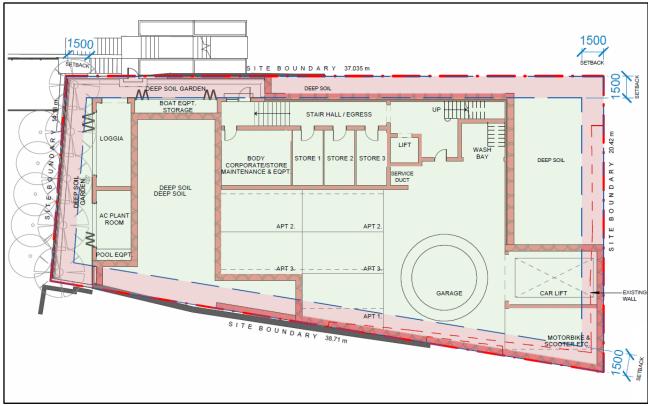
Basement setback diagram. Source: Submitted Architectural Plans
